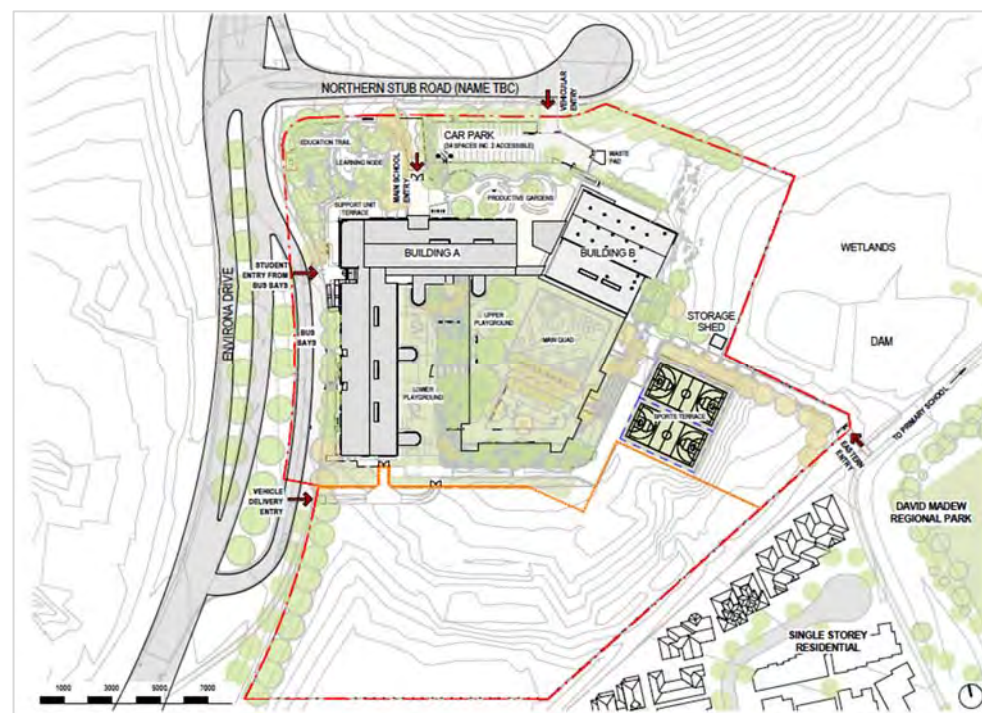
JHS Proposed Site Plan (Source: TKD Architects)
